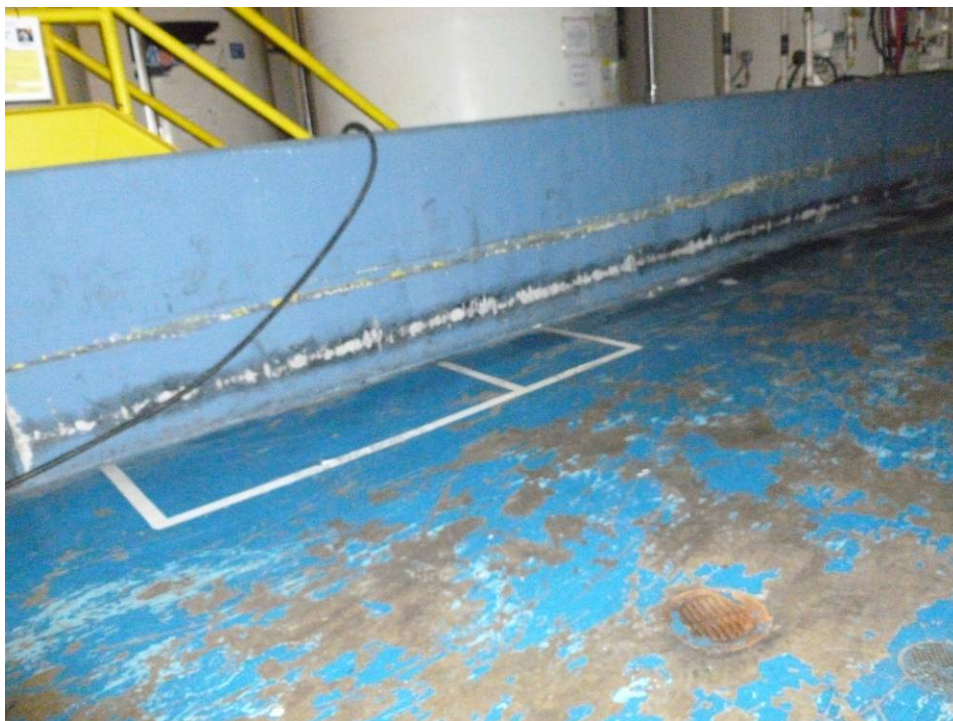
(AOI-35) Equipment in Air Compressor Building. Lines extending from equipment located in northeast area of building to drain. Note dark staining and oily residue.
